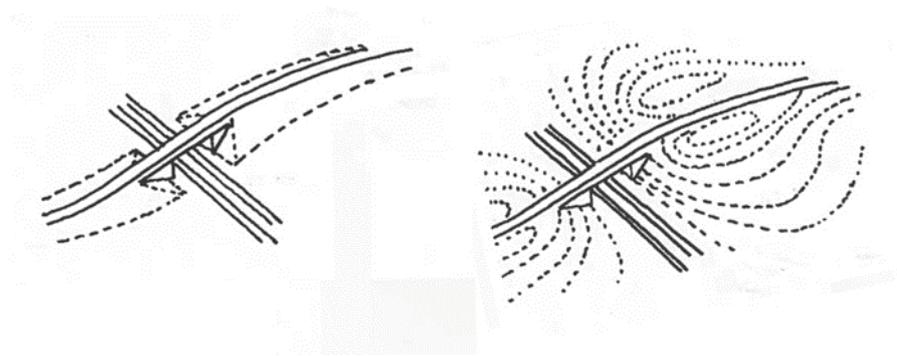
The integration of highways – a road crossing is shown in this example. The drawing on the left shows a road crossing over HS2 with the engineering earthworks (required to create the horizontal and vertical alignment of the road). The drawing on the right shows modified landform to integrate the road with the local topography and take the opportunity to return adjacent land to agriculture.
